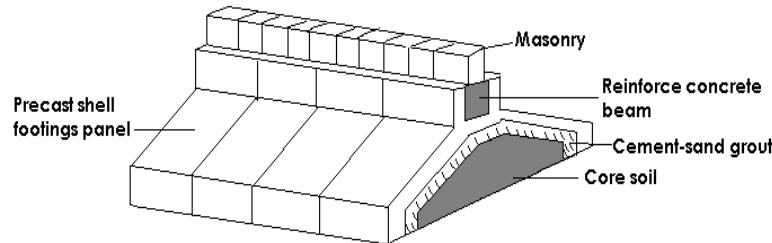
Pre-cast triangular shell footing for load bearing wall.
